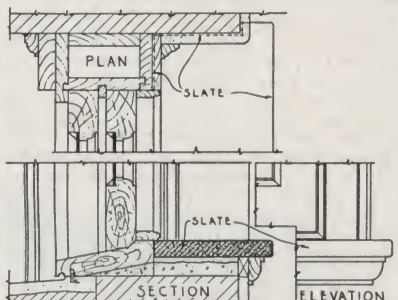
Detail, Perry High School and Addition, Pittsburgh, Pa. Typical also of slate sills in many other school buildings by Robert Maurice Trimble, Architect, Pittsburgh. Interior sills slate, 1 1/4 inches thick, bedded in cement mortar throughout each length with butted joints occurring at the mullions. All exposed arrises and corners heavily rounded. Extra cut-out on end of sill required by returns of nosing over return of apron. 1/8 inch x 1 1/4 inch galvanized iron strips between wood and terra-cotta outside sill.
